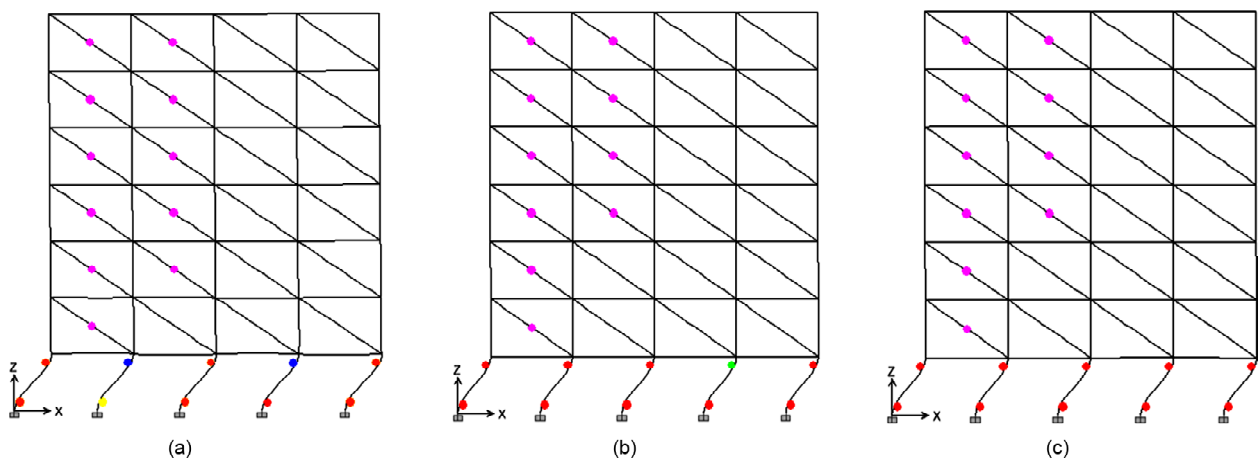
Failure mode of building with: (a) Brick units (b) Fly ash units and (c) AAC units.
